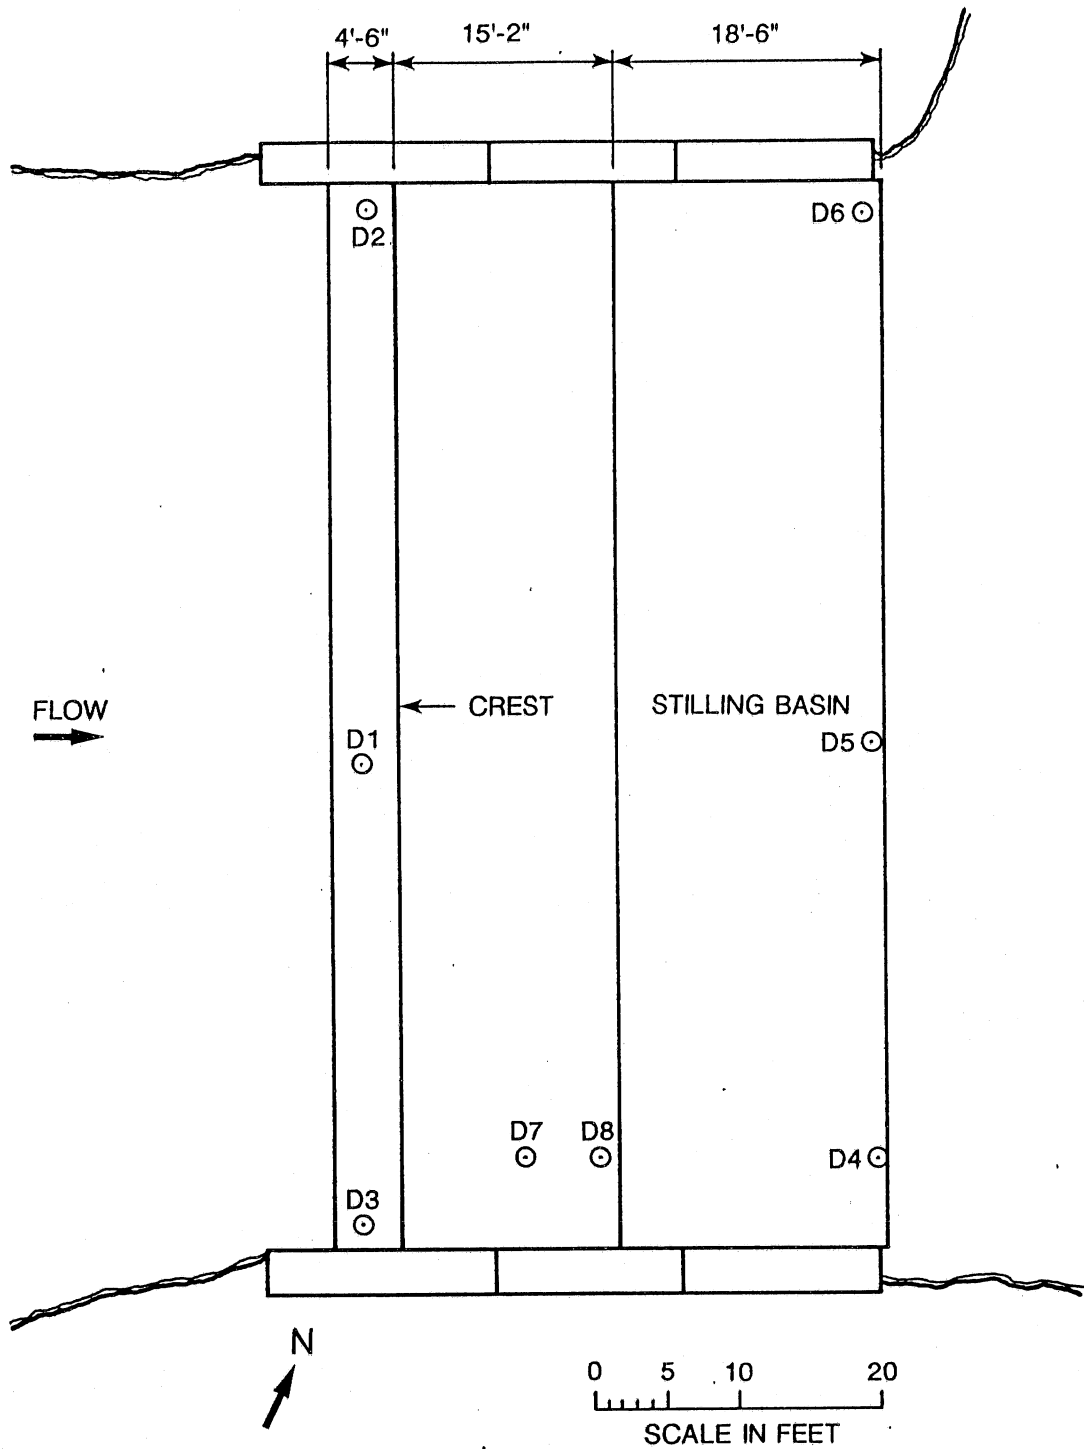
Plan view of January 13, 1986, sampling locations.
